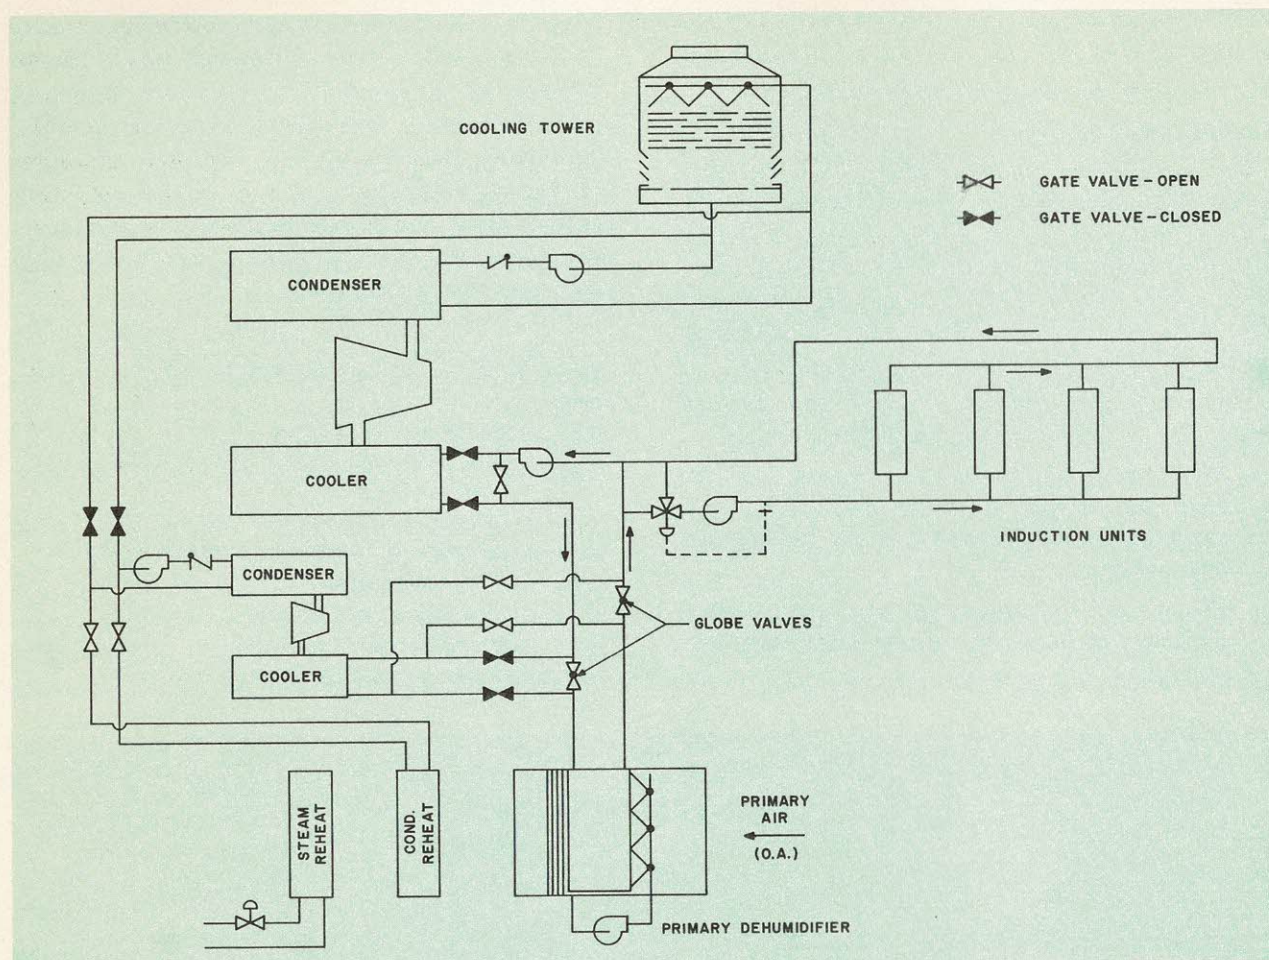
OFF-SEASON COOLING WITH AUXILIARY COOLERS IN SERIES
